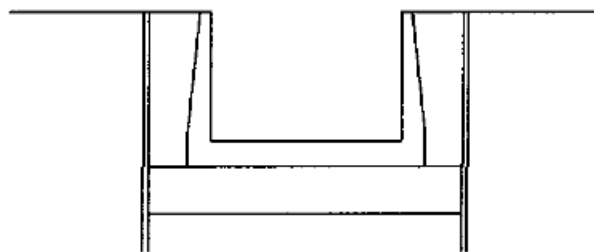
Simple demonstration of a construction pit and with an underwater concrete flooring
